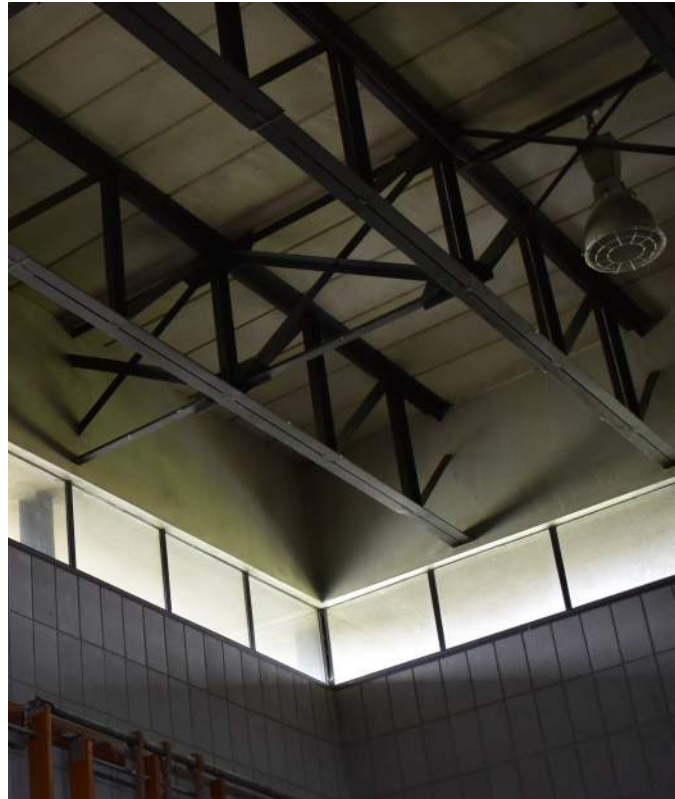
Building D, open web steel joist roof structure (ERA, 2021).
